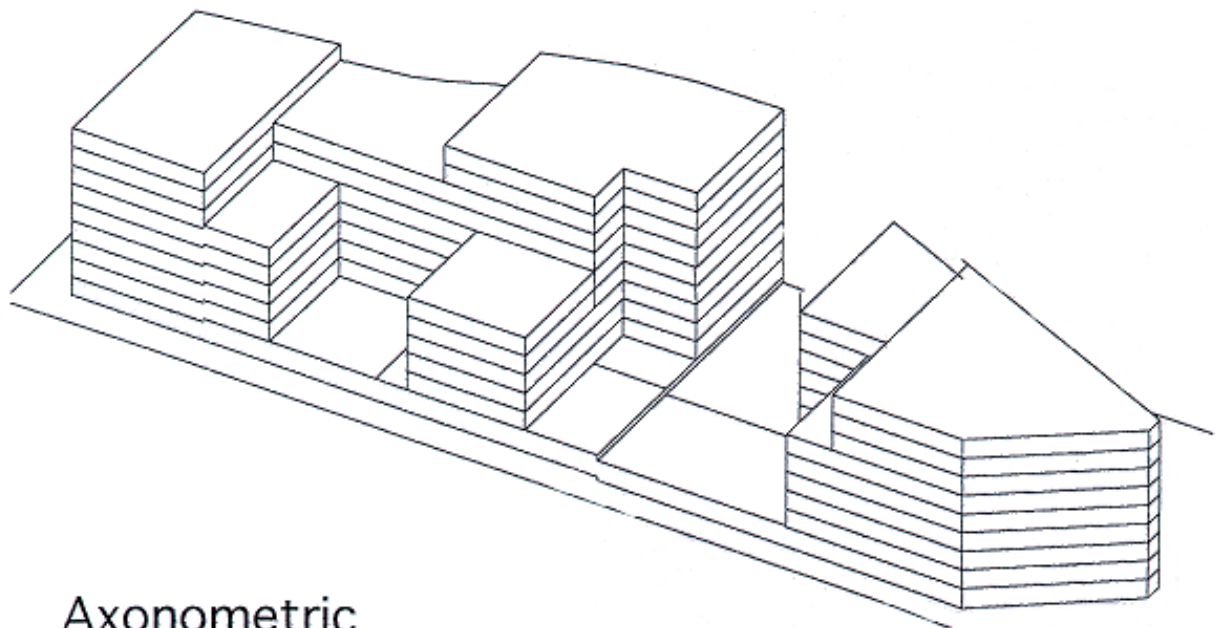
Block 34, Site A to F, Elevations and Axonometric Diagram
